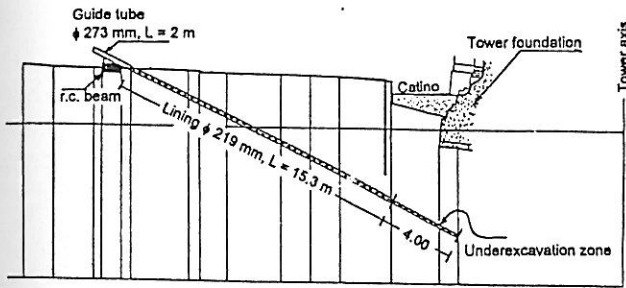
Preliminary underexcavation experiment beneath the tower: cross section
